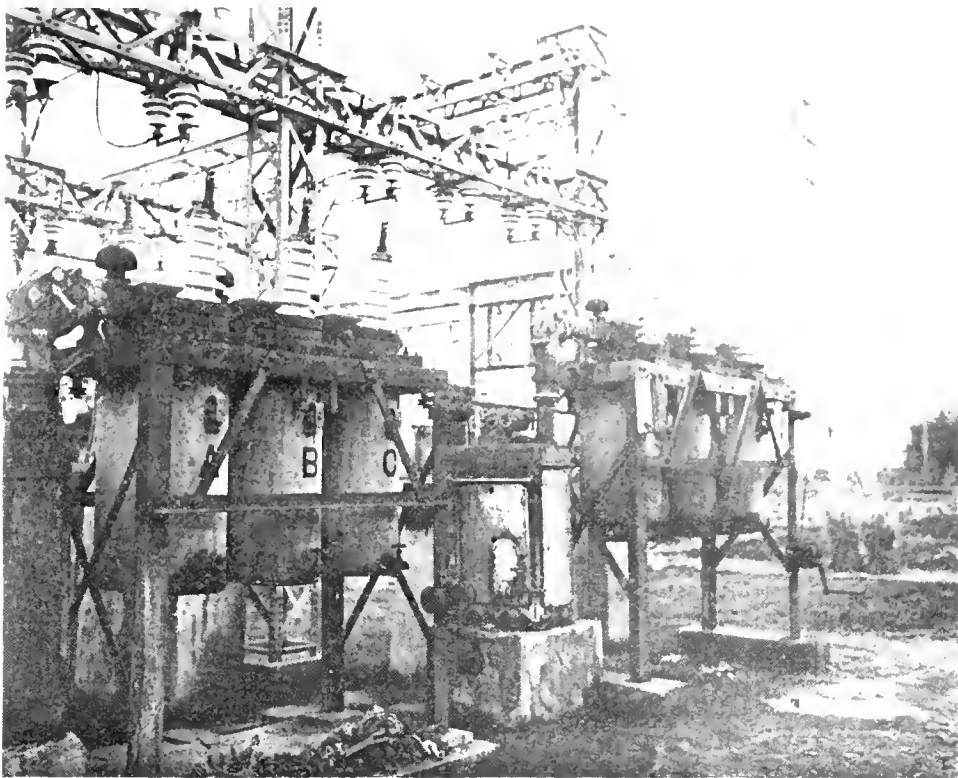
Chigasaki substation—22-KV OCB damaged by fire
